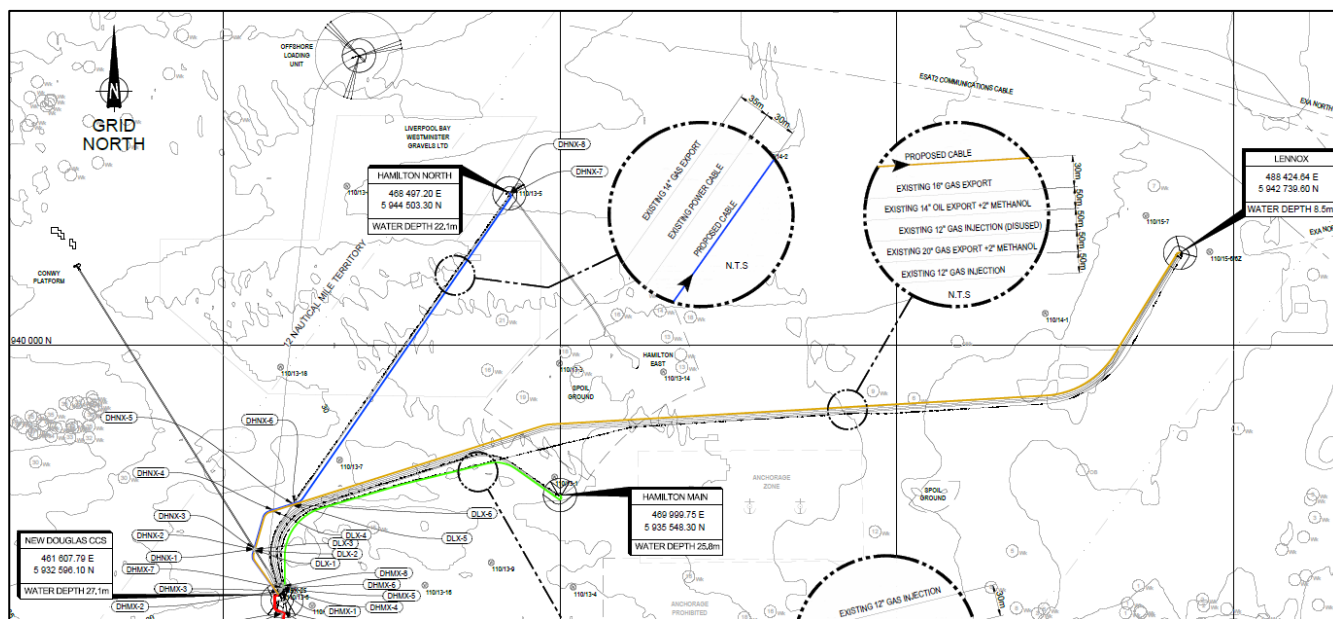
Crossings Identified on the Offshore Cable Field Layout for the Power Cable from Douglas CCS Platform to Hamilton Main, Hamilton North, and Lennox Platforms
